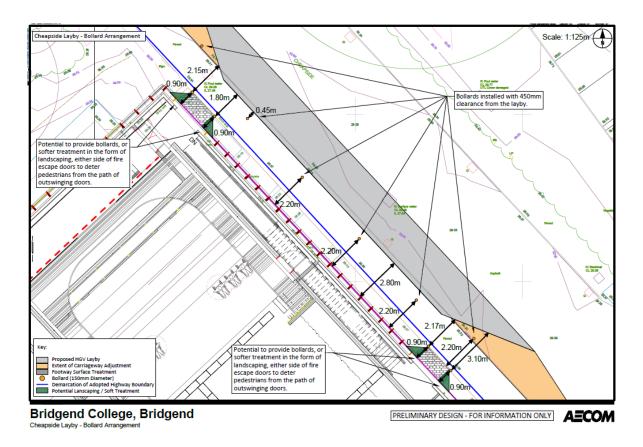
Draft Scheme with Road Safety Audit Recommendations
